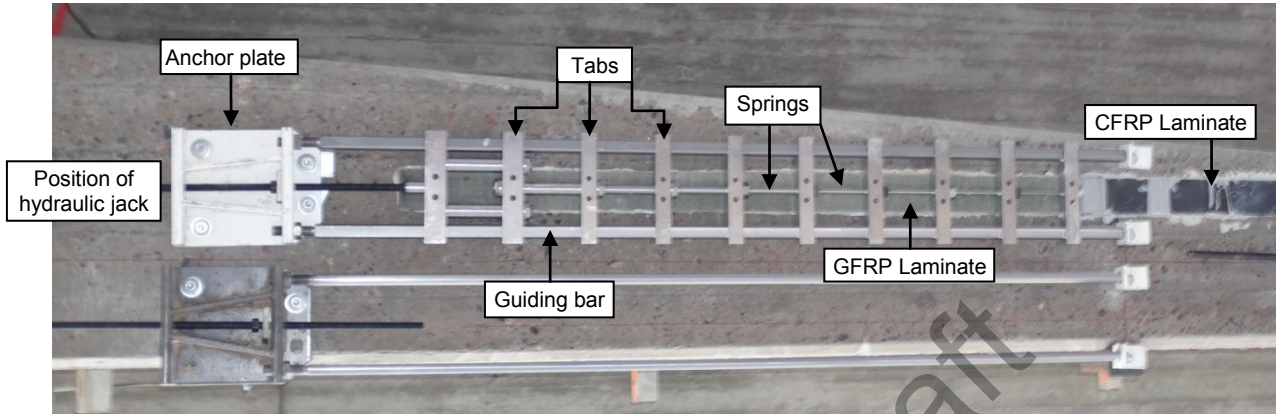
Key components of the device used for anchoring and prestressing the laminate strengthening system installed on the southern girder of Kiruna Bridge.
